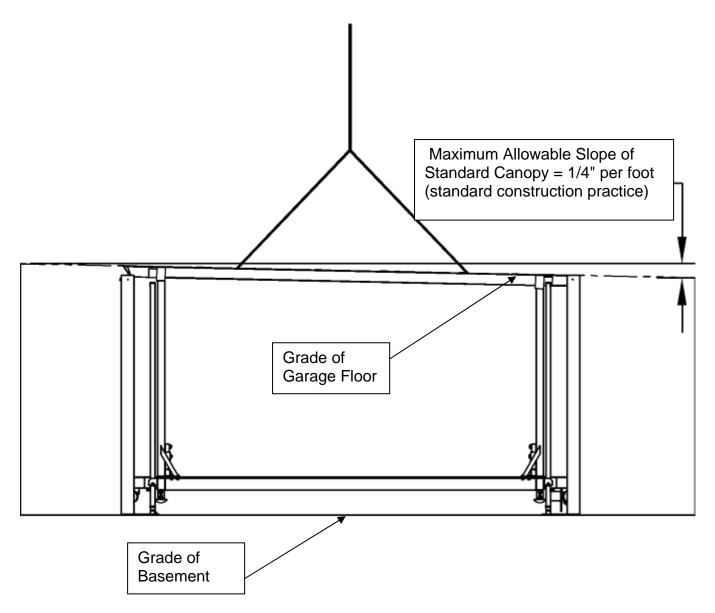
Adjusting Canopy to Match Grade of Garage Floor (Side View)
